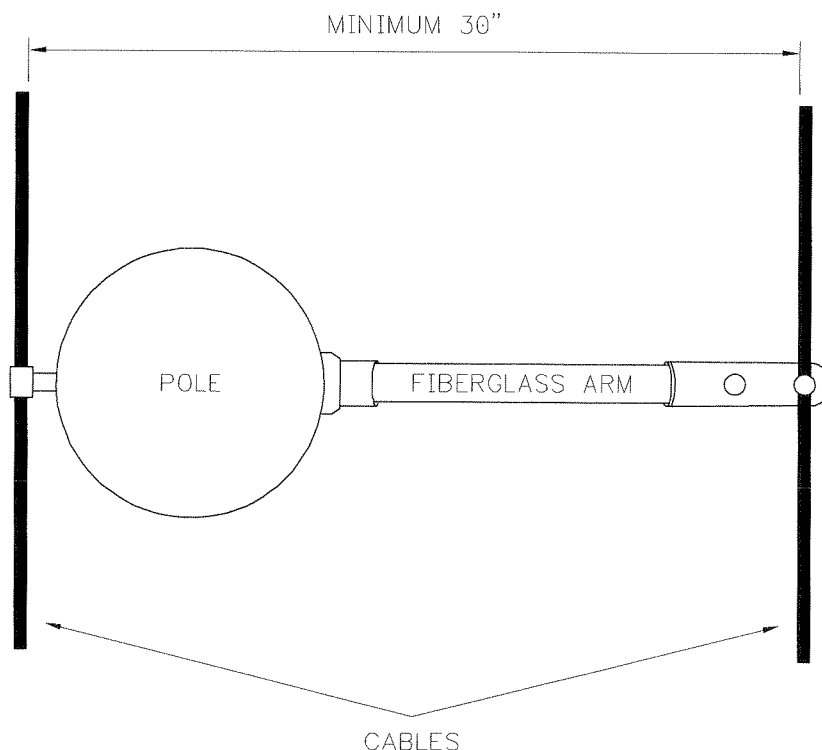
Horizontal Spacing Using Fiberglass Arm
